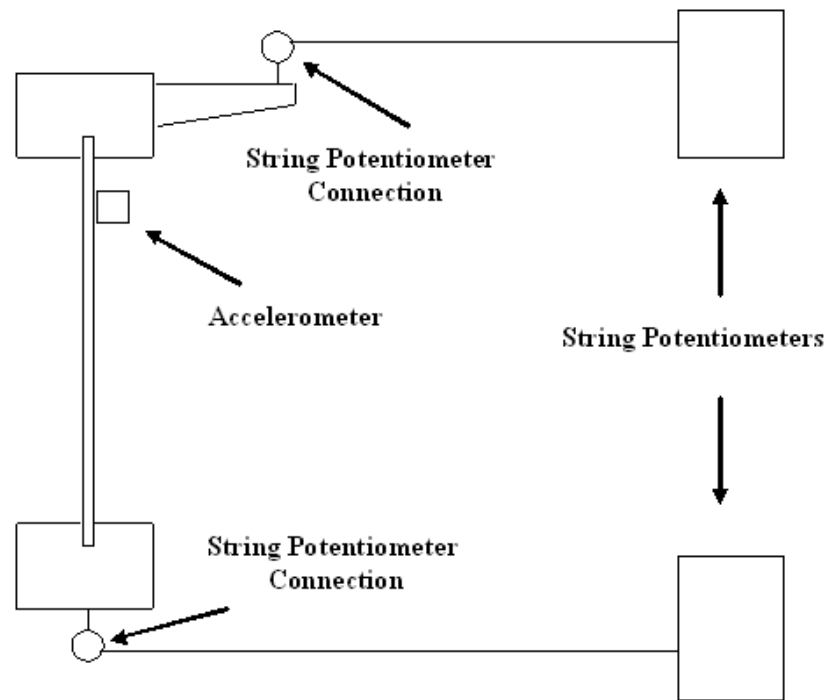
Accelerometer and String Potentiometer Connection to the I-Joist
